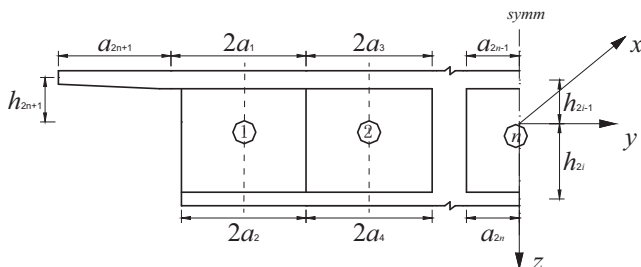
Cross-section of single-box multi-cell corrugated box girder.
